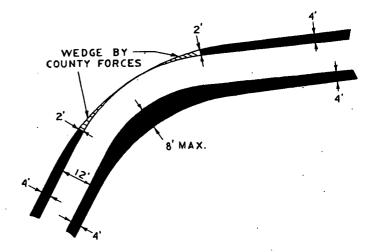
Plan view of typical widening operation (Frederick County Roads Board).
